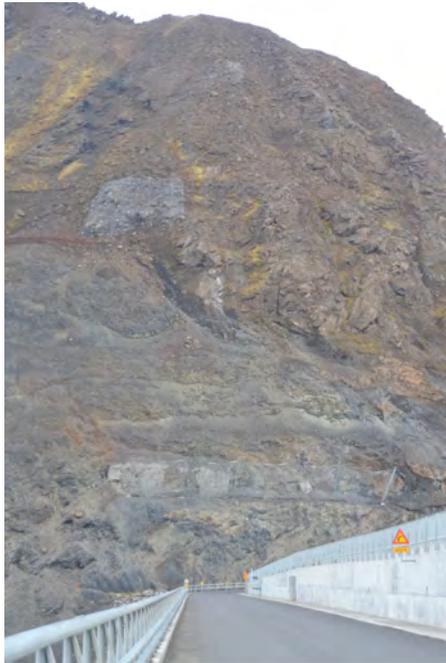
Road across Kárahnjúkar dam with rock fall protection fencing and netting
